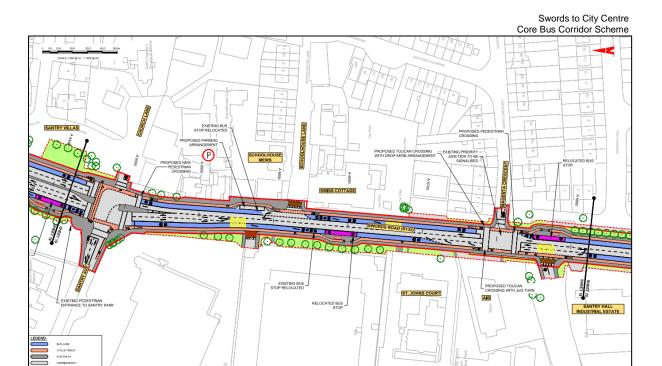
Extract of the Proposed Scheme General Arrangement Drawings (Sheet 19)
